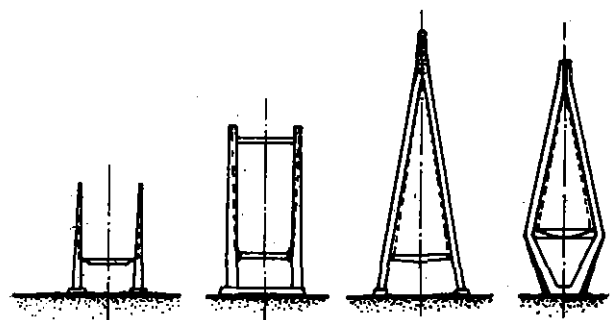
Transverse arrangement of pylons... Two lateral layers of stays
